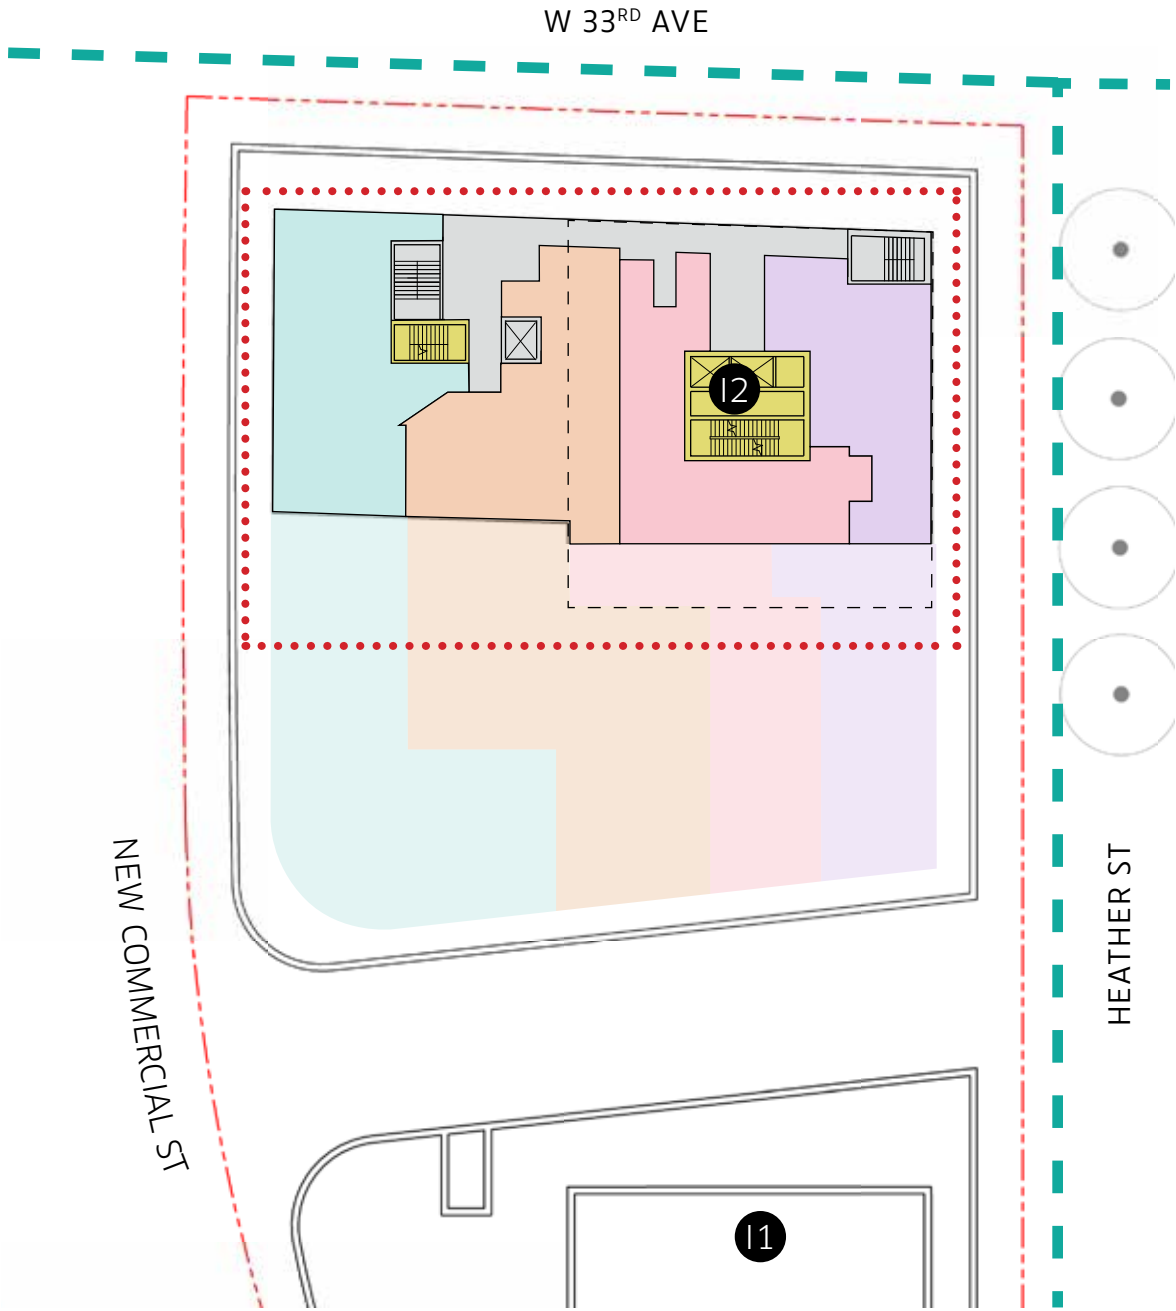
Childcare Centre Plan - Building I2, Level 4
